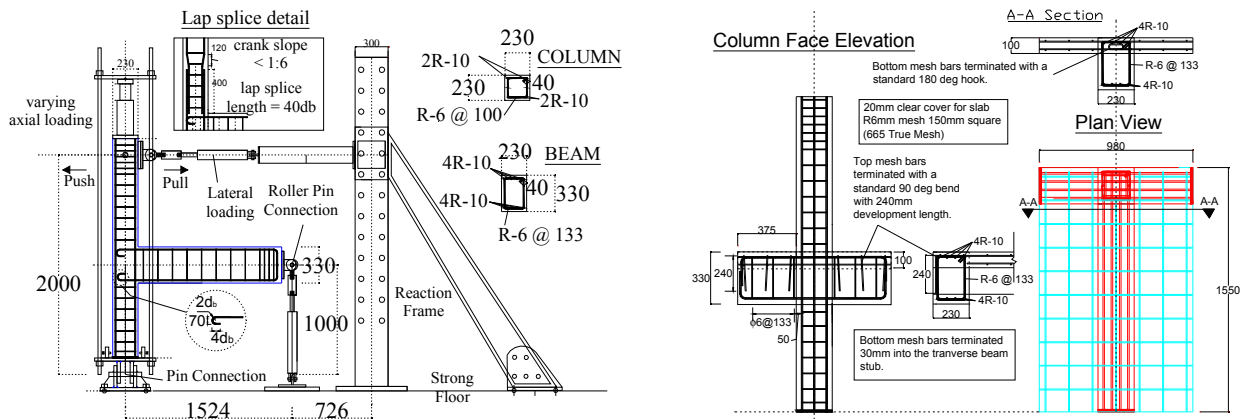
a) Experimental Test Setup and reinforcing detail for benchmark units without slab b) Reinforcing detail for b-c joint with slab (unit shown are in mm).
